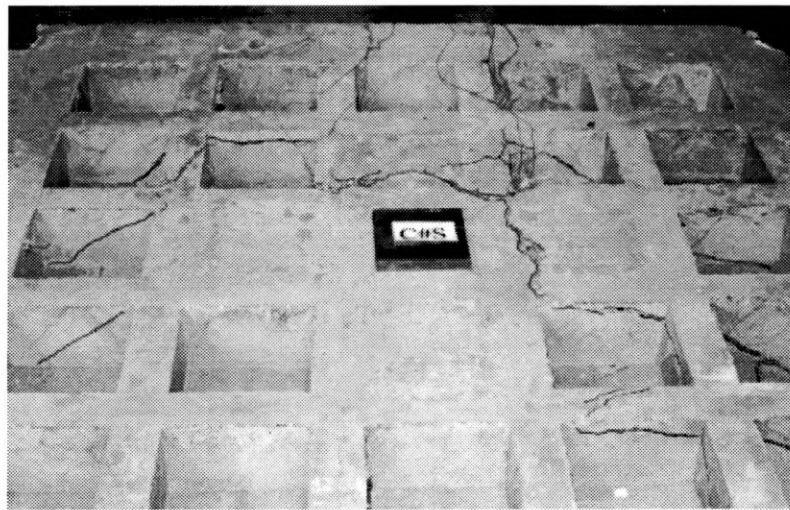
(e) Crack pattern after punching failure — slab No. 5
